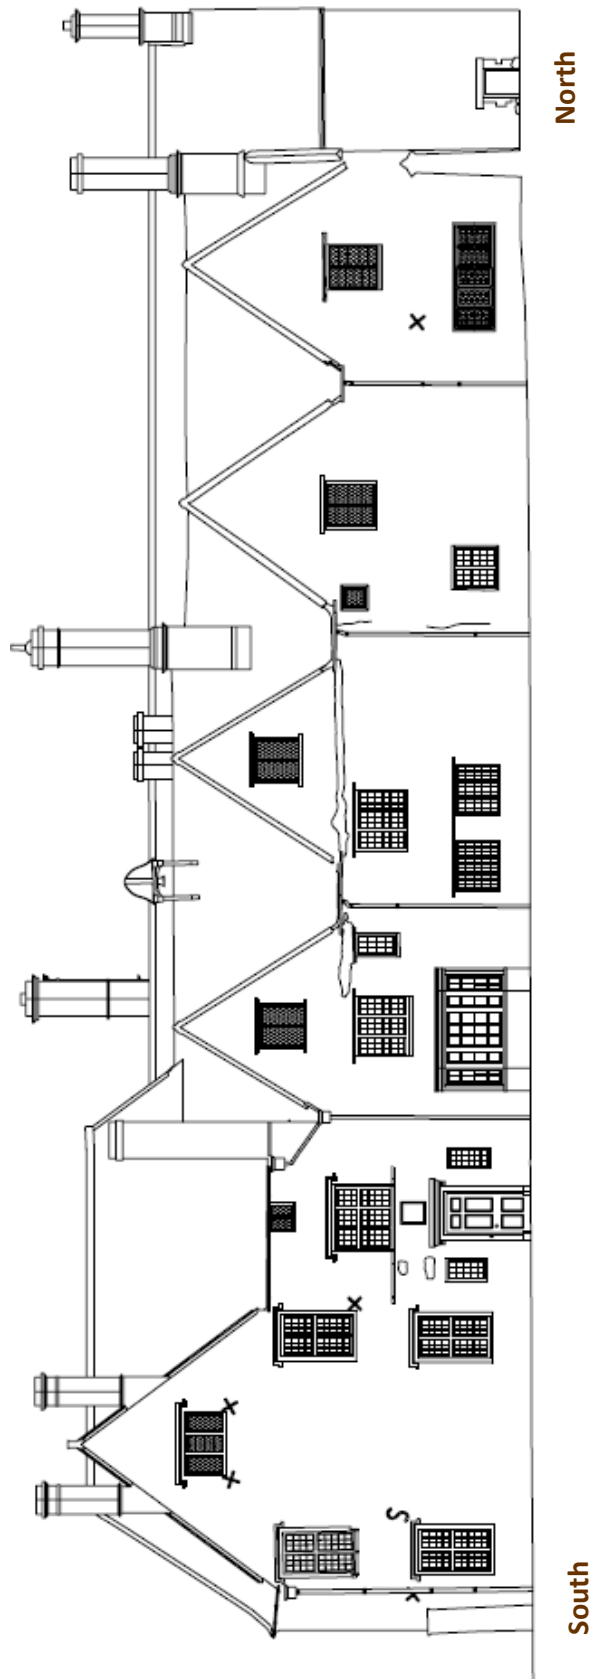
East elevation of Avebury Manor (after Wessex Archaeology)
